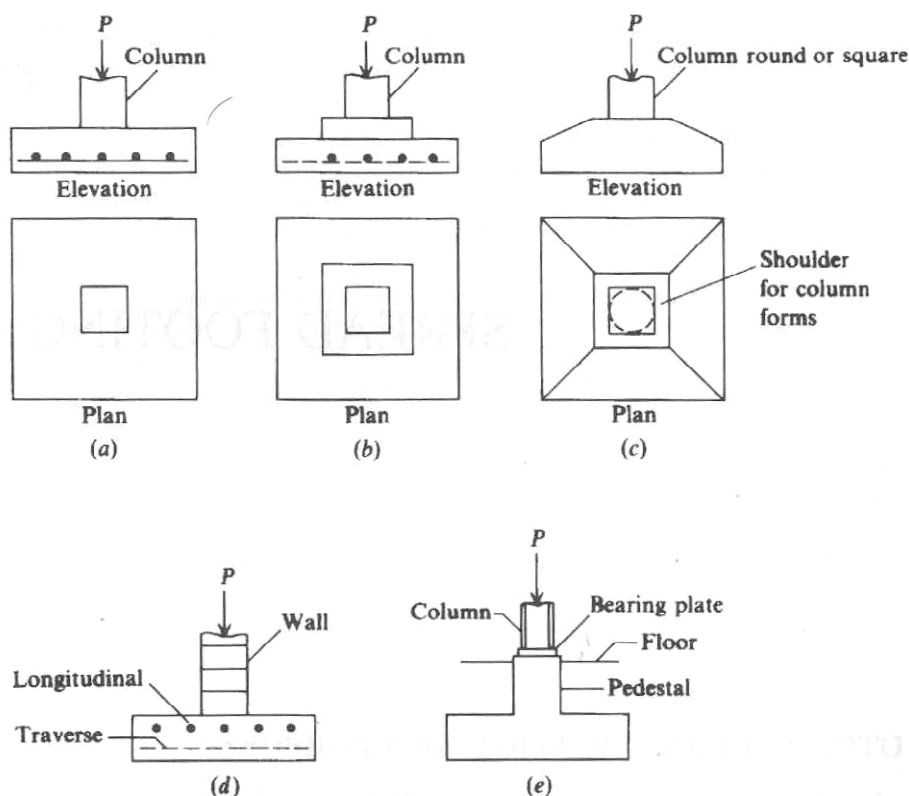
Typical footings. (a) Single or spread footings; (b) stepped footing; (c) sloped footing; (d) Wall footing; (e) footing with pedestal.
